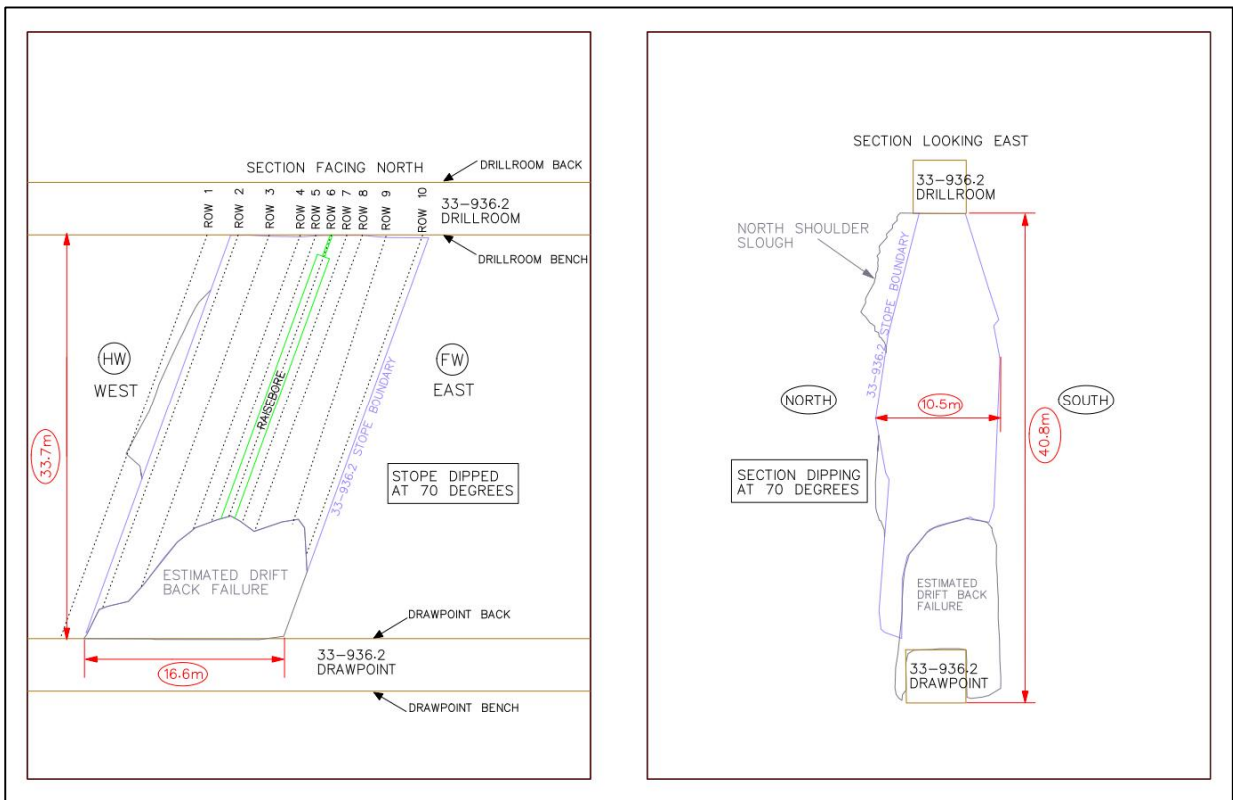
Longsection and cross-section of the 33-936.2 slope
